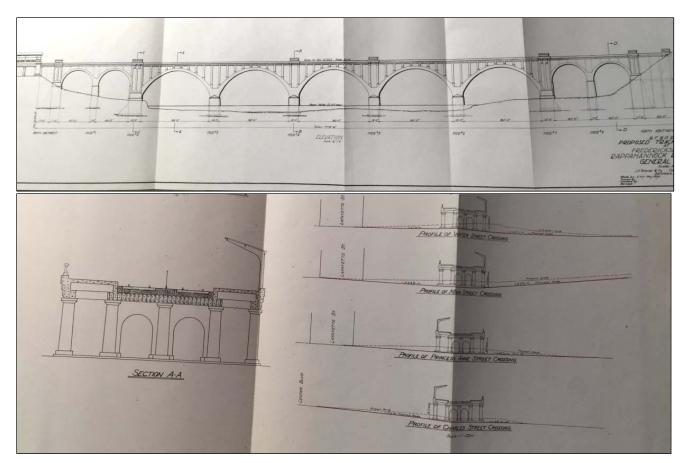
A 1924 PROPOSED DRAWING OF THE RAPPAHANNOCK RIVER RAILROAD BRIDGE (GREINER AND COMPANY 1924): OVERVIEW (TOP); DETAIL OF SPANS (BOTTOM)
